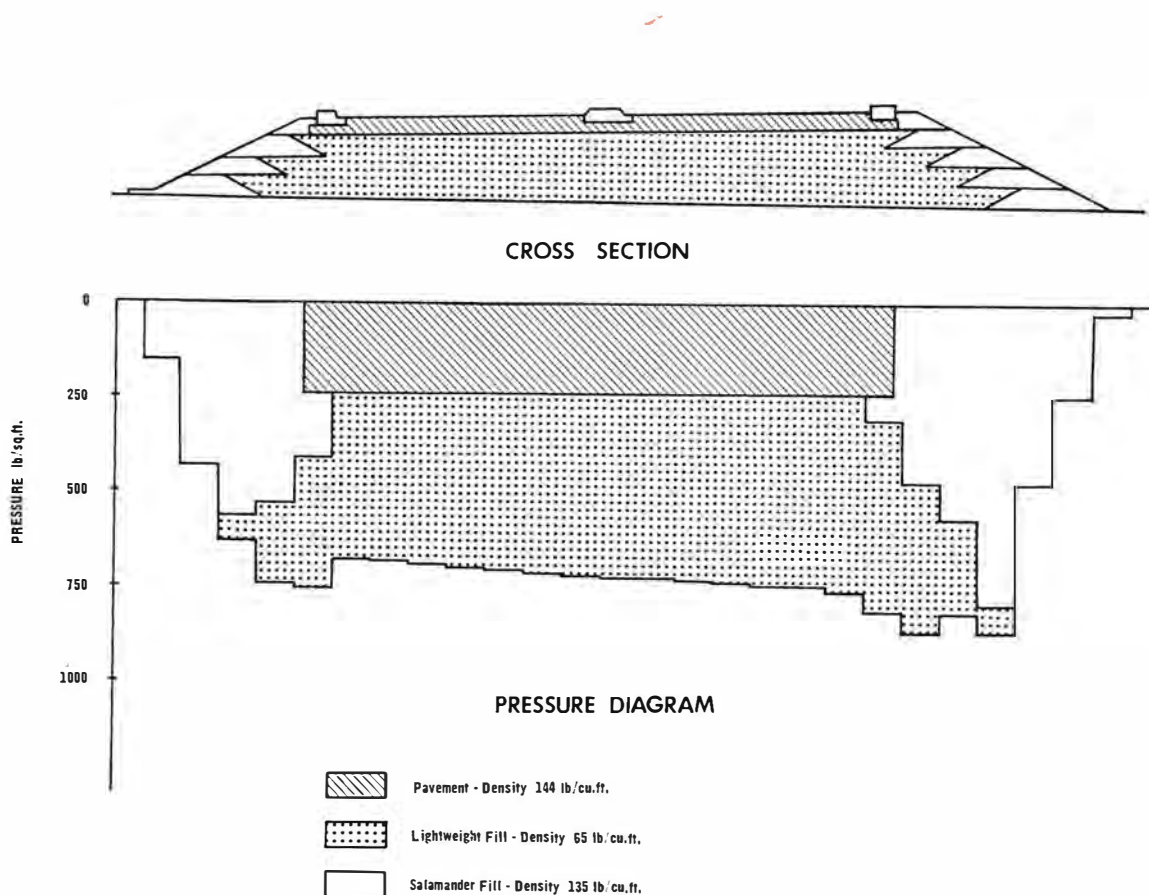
Graham Street Overpass, northern approach embankment. Cross section and corresponding pressure diagram.
